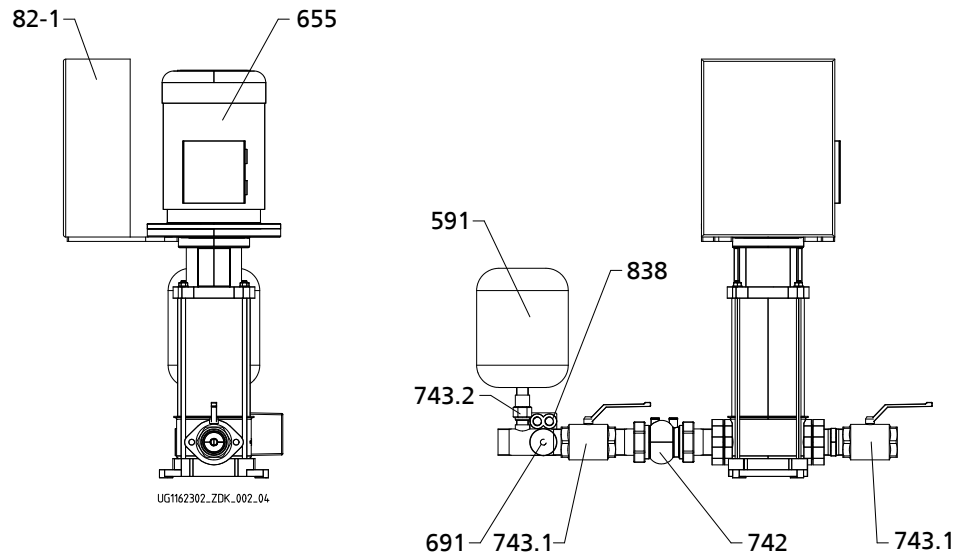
General assembly drawing of DeltaSolo D with Movitec 15
